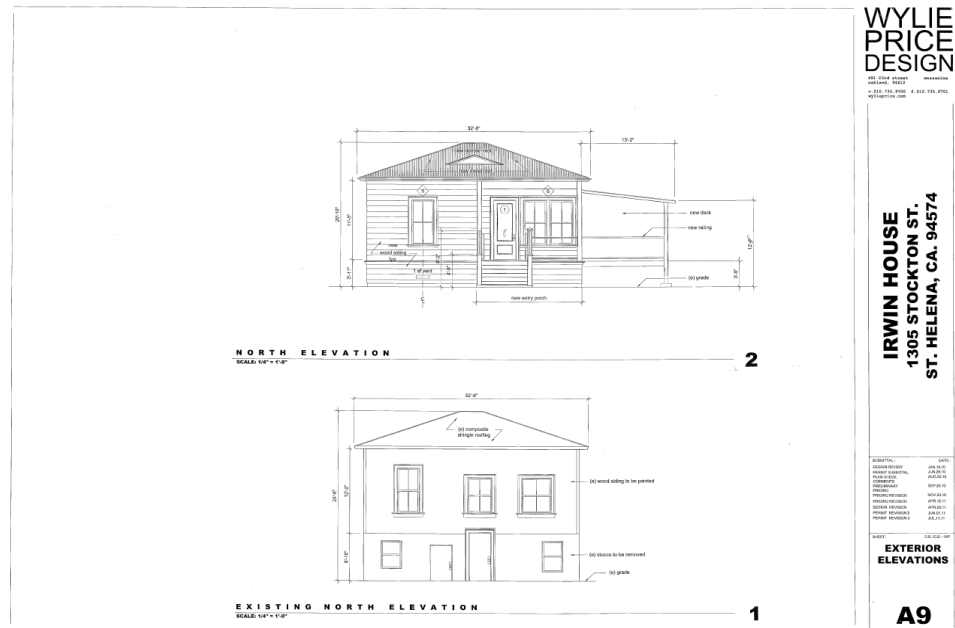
Architectural Drawings of the northeast elevation (Willie Price Design, 2011).
